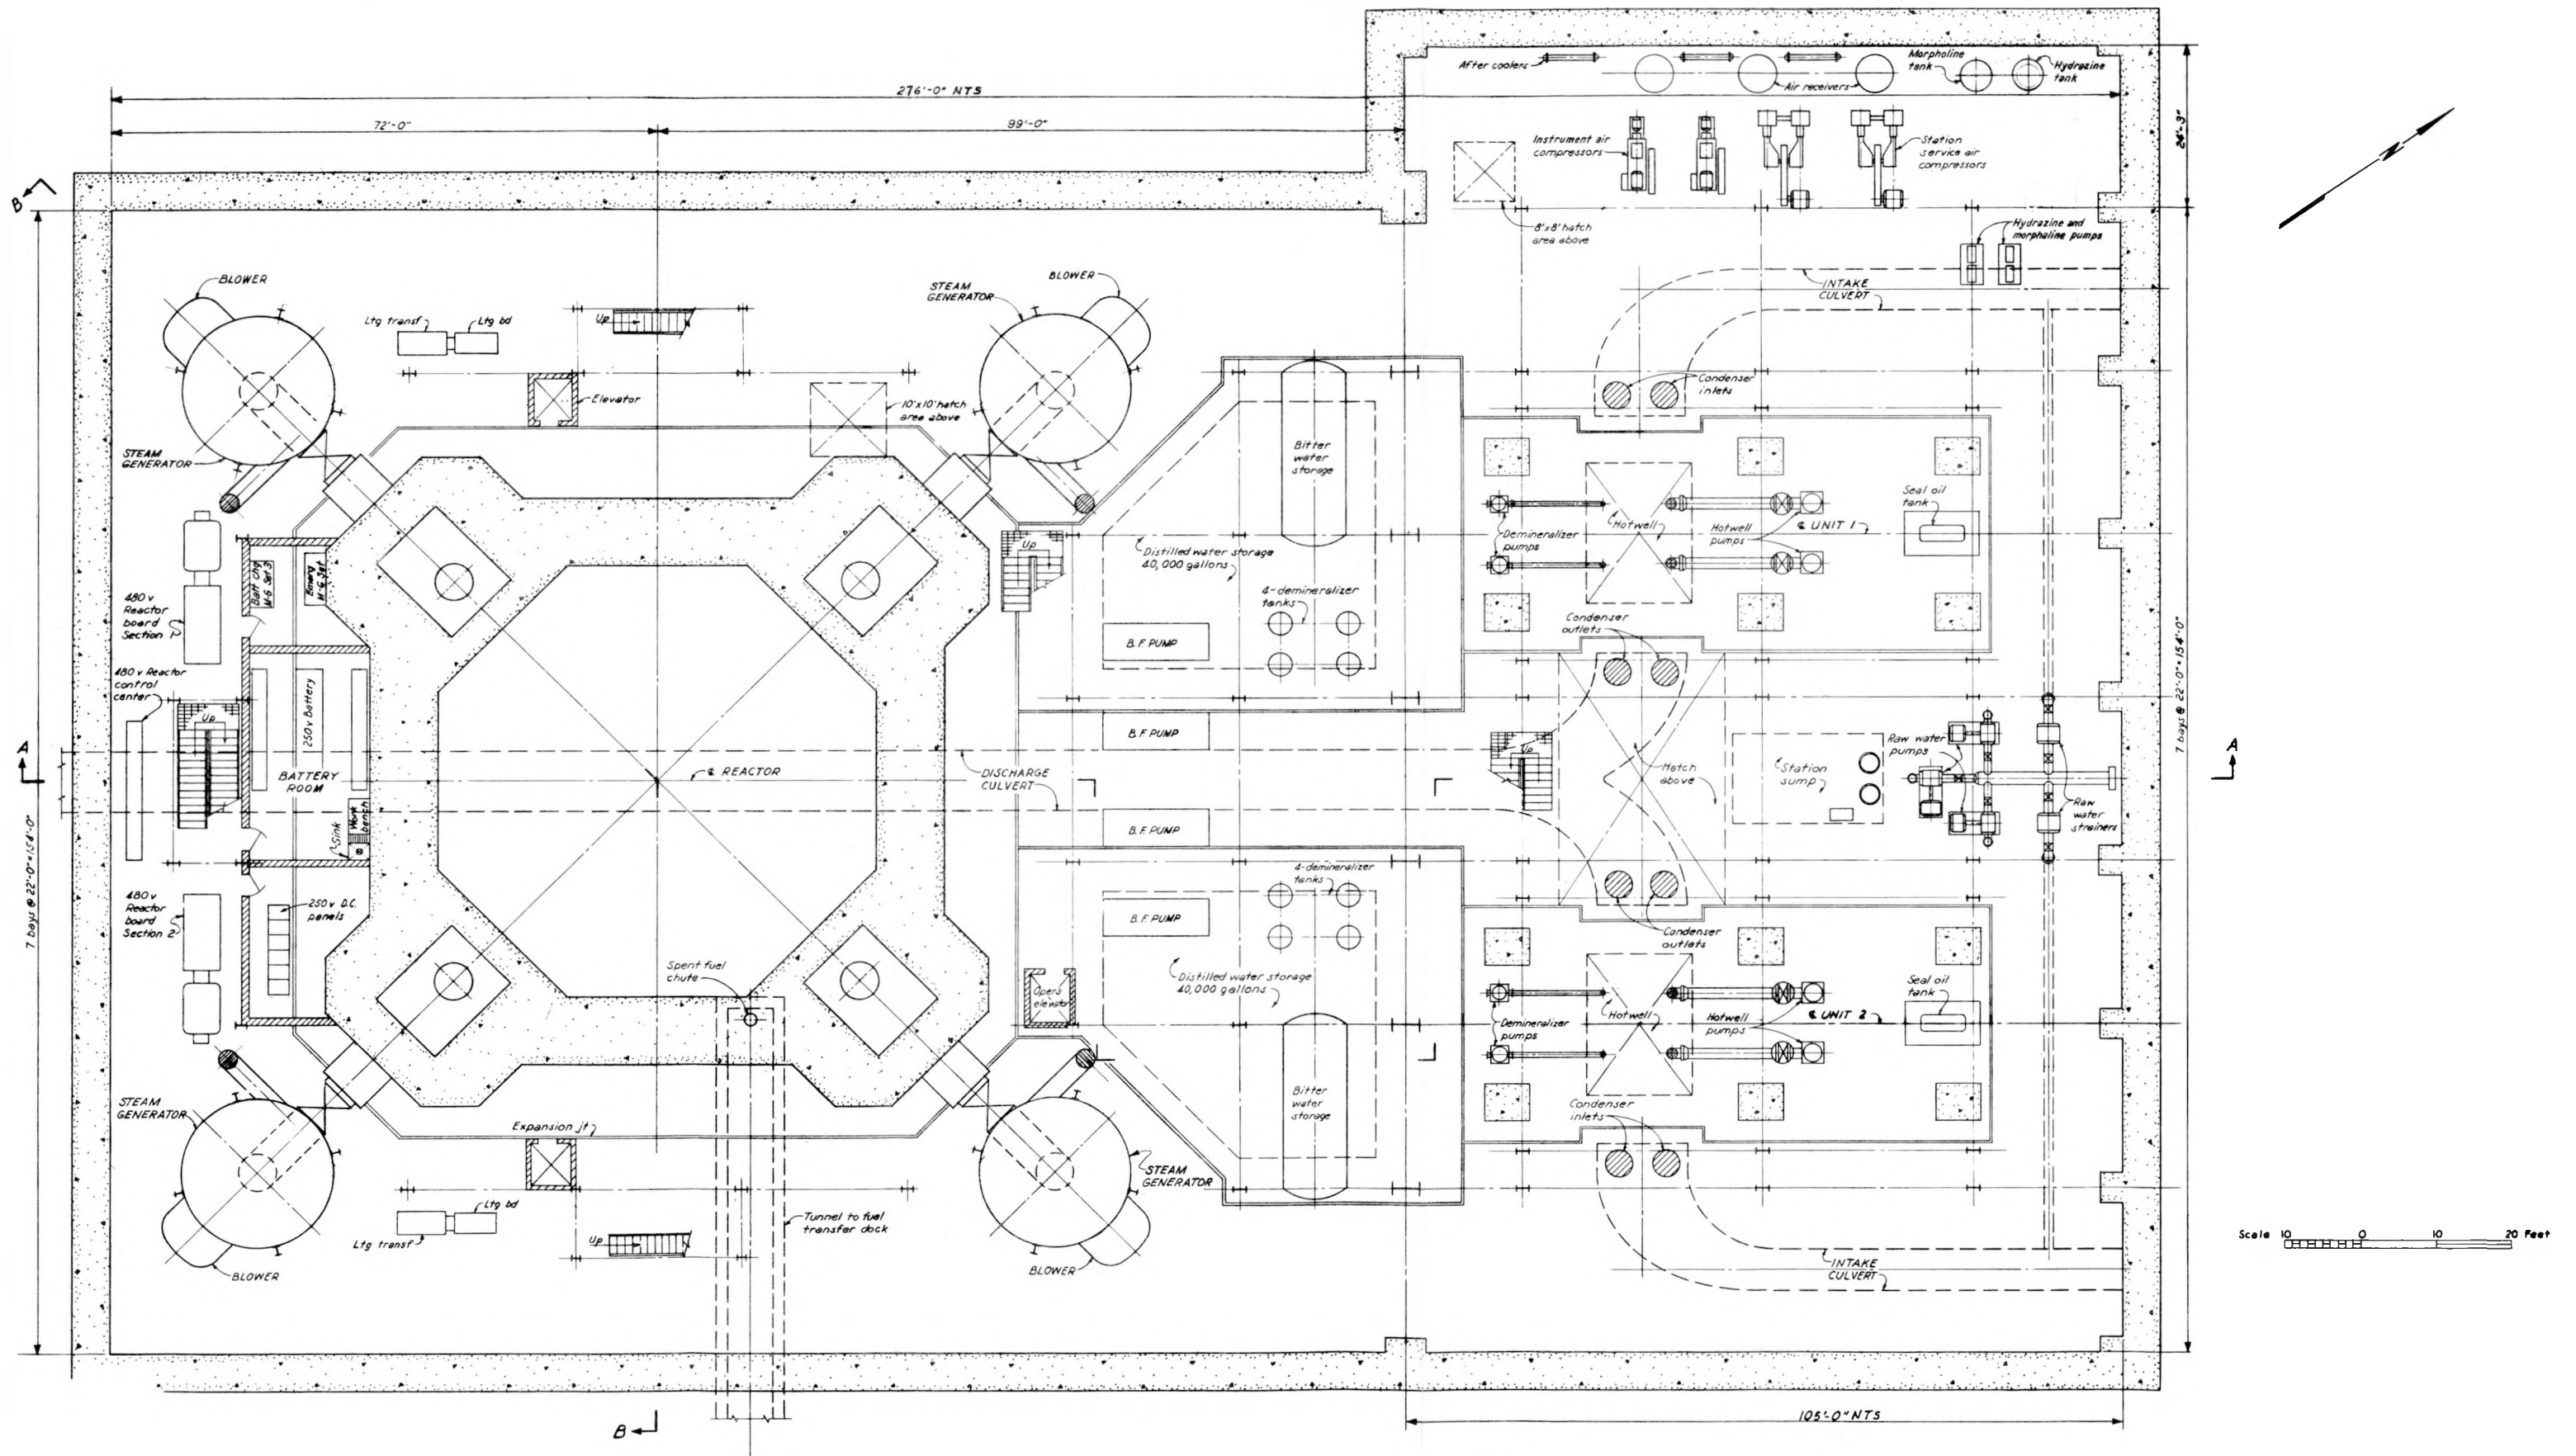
Equipment Layout at Elevation 685.0 (ORNL - GCR-2) (Design Div., Tennessee Valley Authority).
